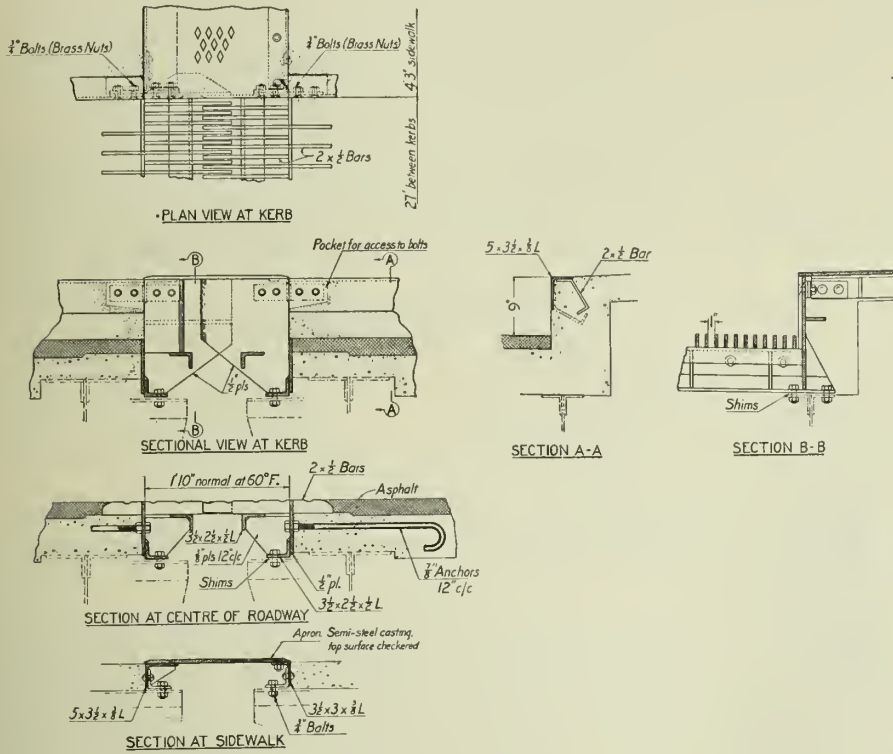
Typical Expansion Joint for Roadway and Sidewalk.
